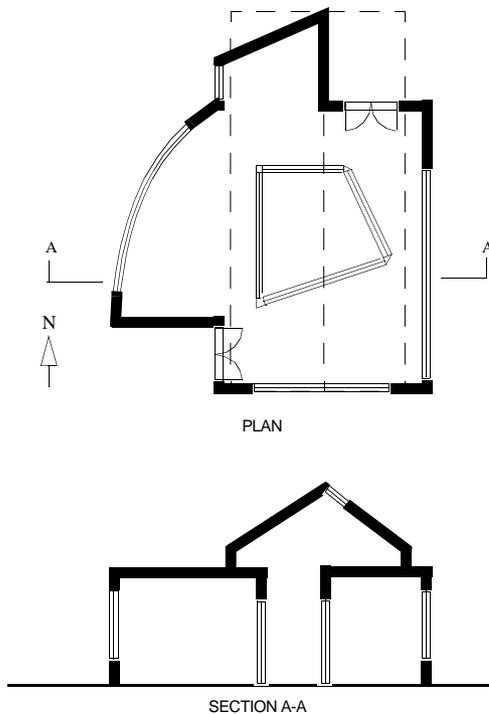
Schematic plan and section view of the demonstrative Casa Macabre
